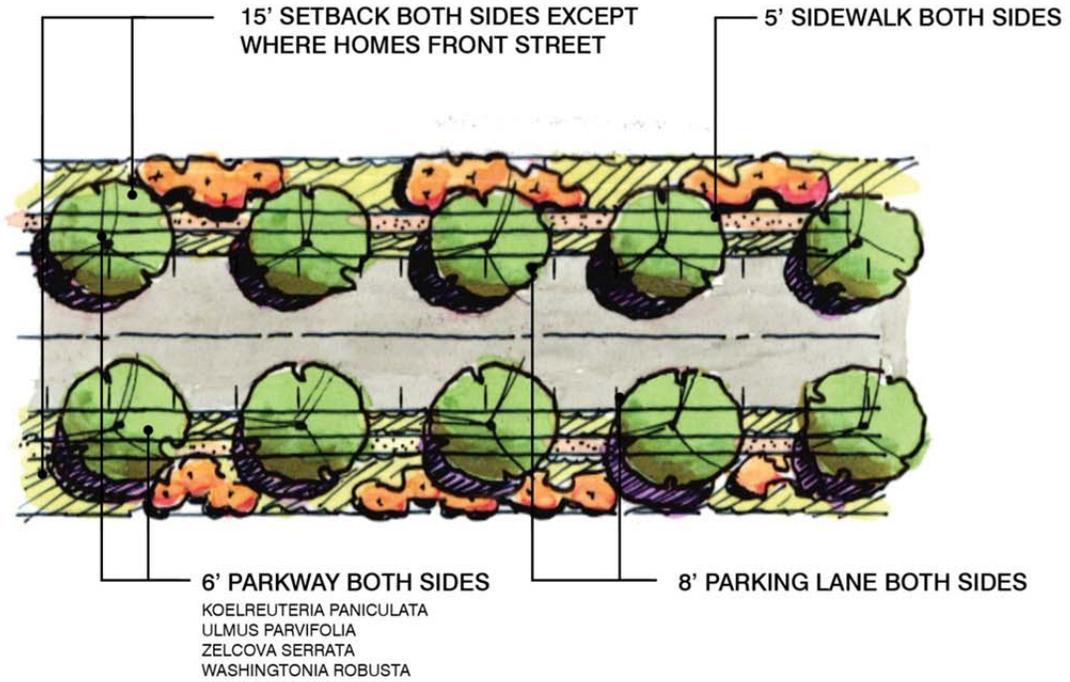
F. Street Sections: "B" Street & "C" Street East of "A" Street
